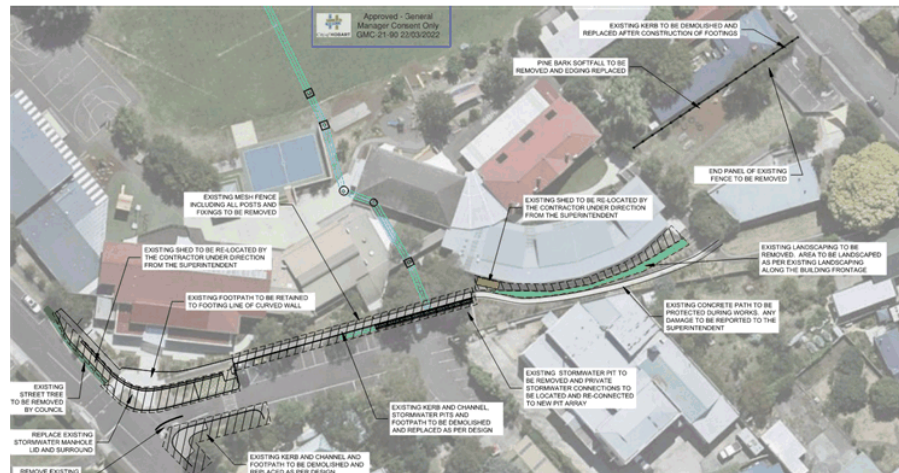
Site plan showing the proposed works. Source: Applicant documentation.
